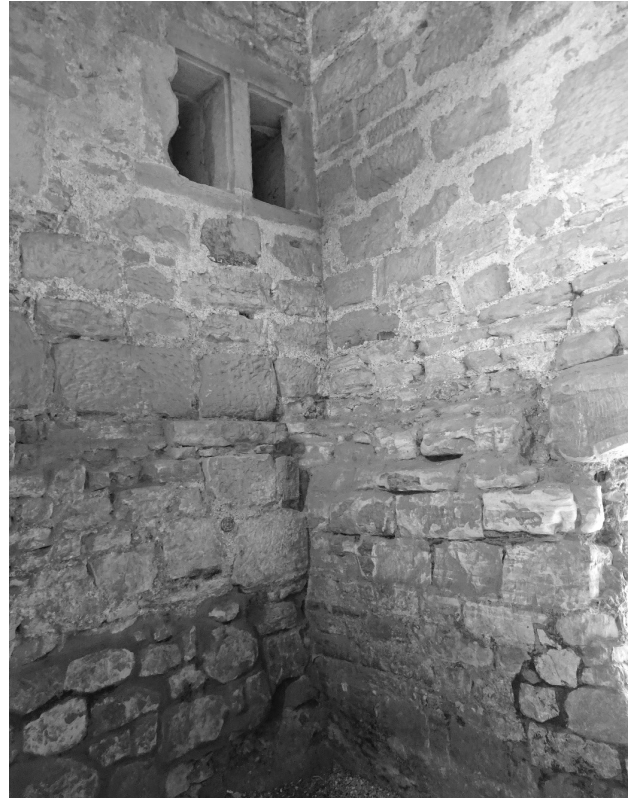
Straight joint and rebuilt walls in basement level of east tower, also showing cupboards where stair access would normally be. Photo by Penny Copeland.
